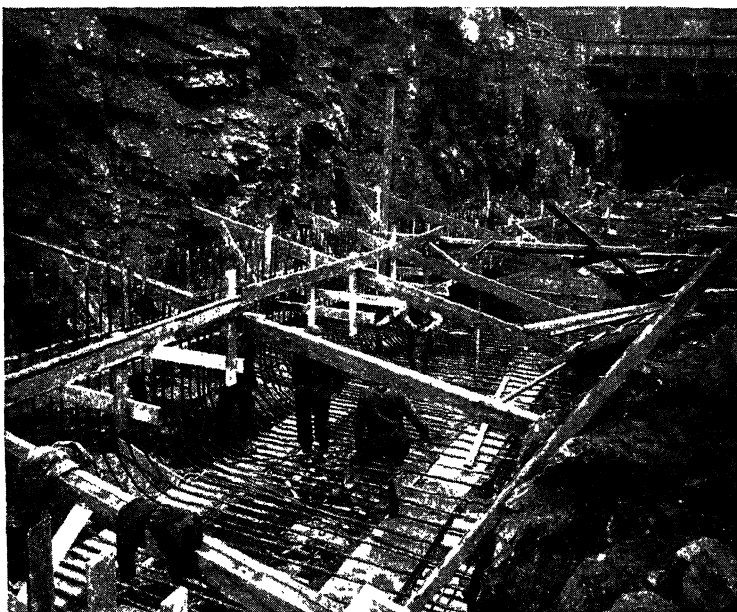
Placing reinforcement in the footing of a retaining wall, Lincoln Tunnel, New York City.
